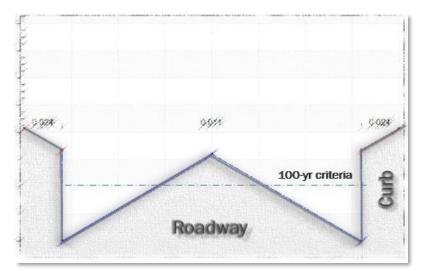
Conceptual cross-section of street flow intersection conduit illustrating 100-yr, 24-hour storm criteria
